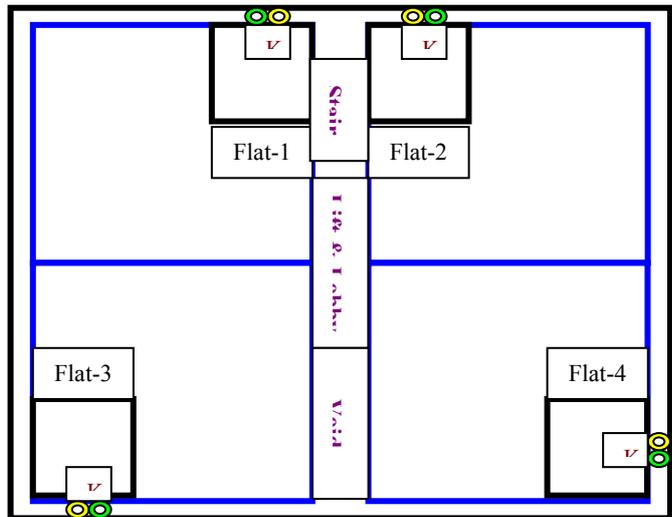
1<sup>st</sup> floor to 15<sup>th</sup> floor plan of multiunit building with waste isolation and disposal arrangement from the kitchen.
